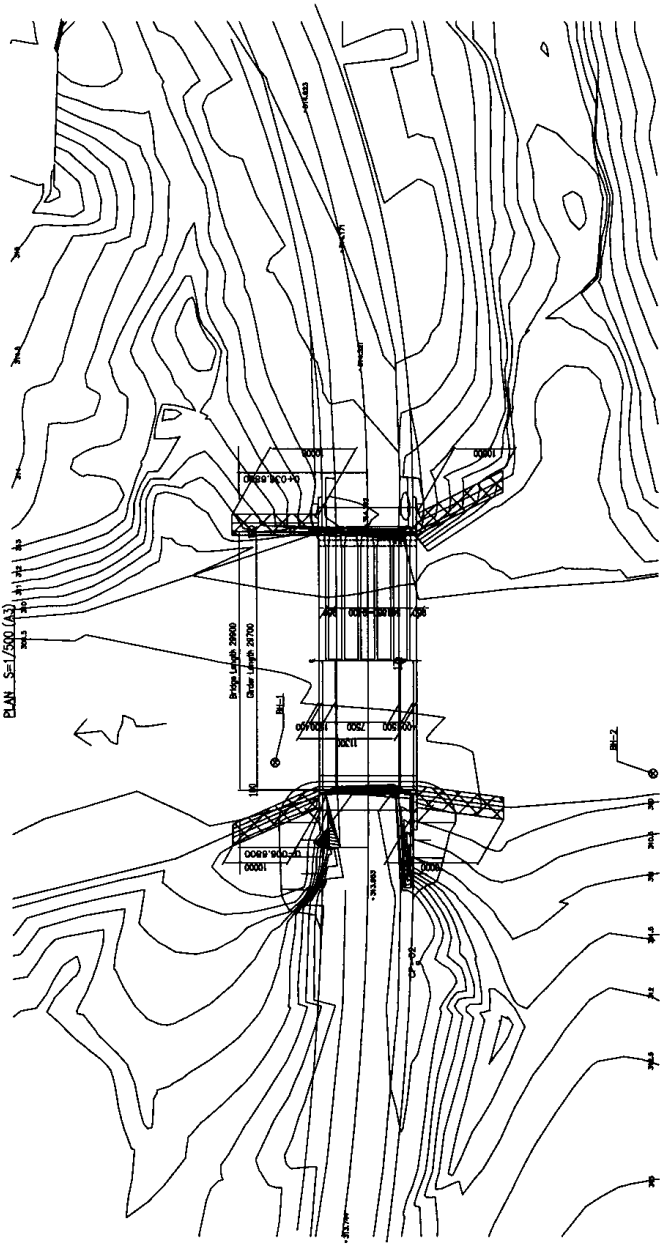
Basic Design Drawing for Gahtelay 1 Bridge
